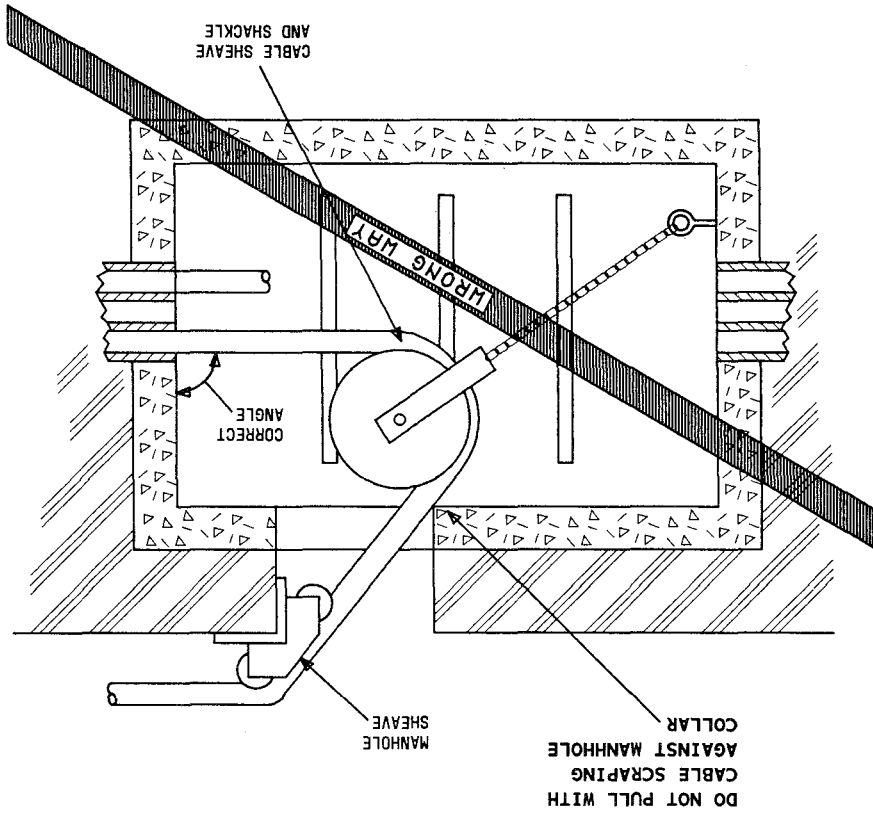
Improper Equipment Alignment—Cable Scraping Collar
